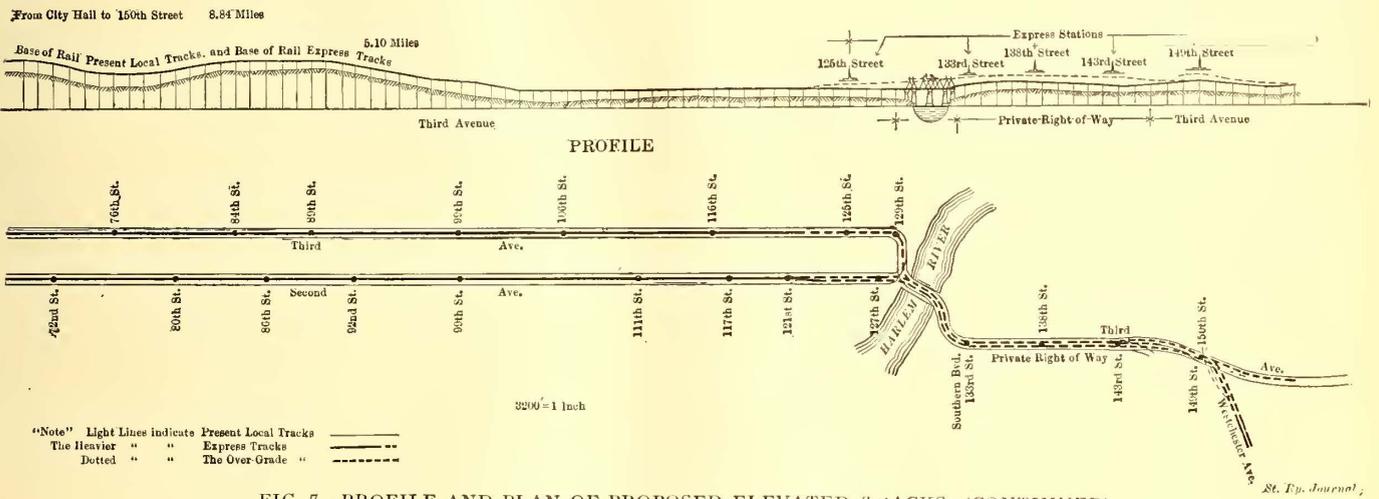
PROFILE AND PLAN OF PROPOSED ELEVATED TRACKS—(CONTINUED)
